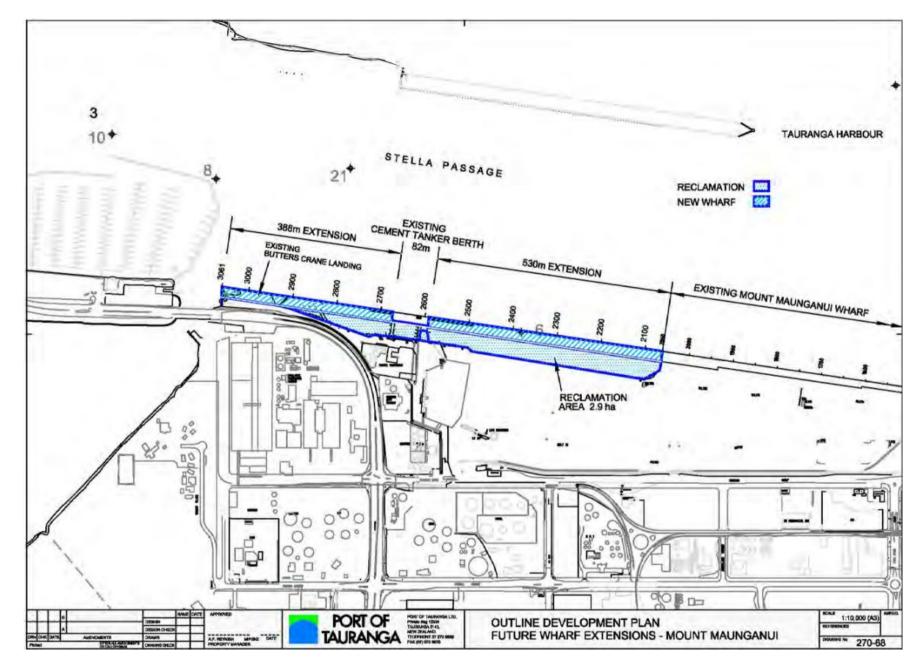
Outline Development Plan 270-68 - future Mount Maunganui wharf extensions.
